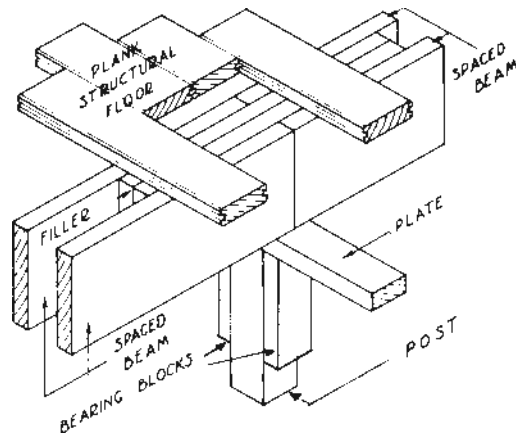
Spaced Beam Bearing Over Basement PostFigure 13 Beam Bearing at Second Floor Exterior WallFigure 14 Spaced Beam Bearing at Second Floor Exterior Wall
